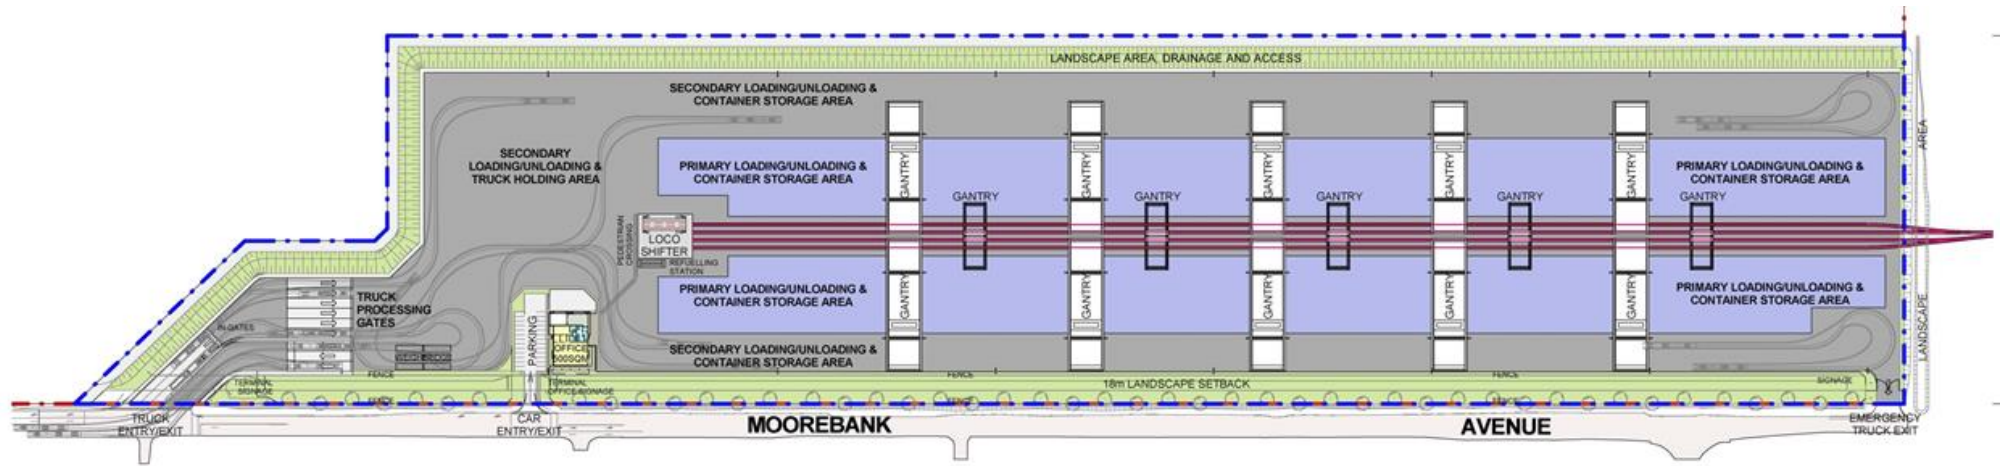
SIMTA Stage 1 Indicative Terminal Plan
